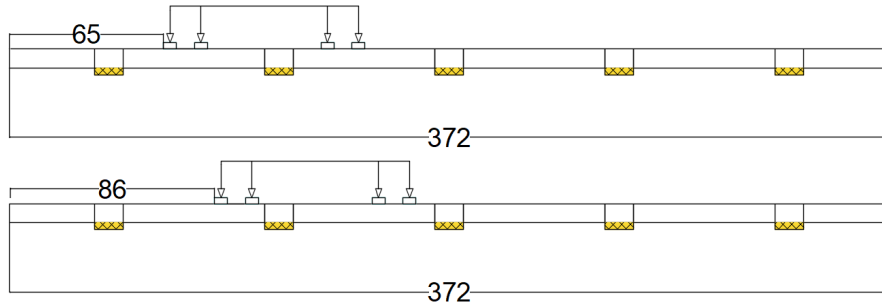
Location of P-15 truck for 6 ft girder spacing deck slab (Case 1, unit: in)
